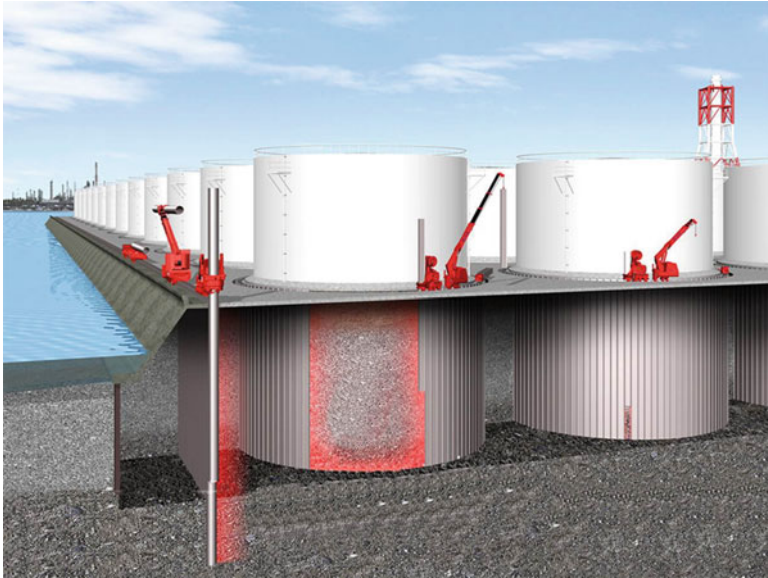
Steel sheet pile wall method (after Japan Press-in Association) [9]
